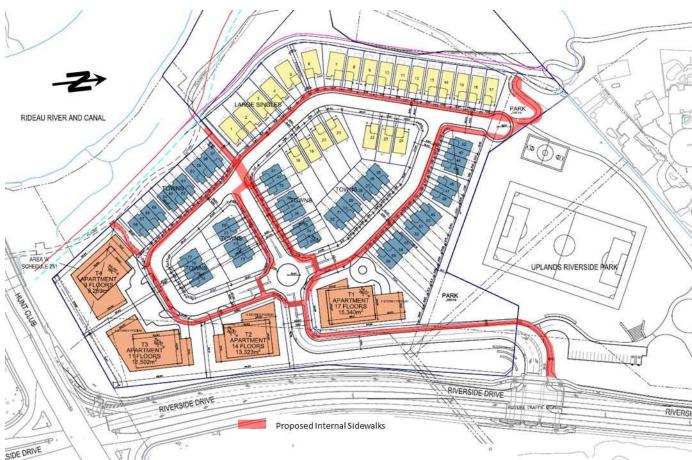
Proposed Sidewalk Connections and Active Transportation Routes to Transit
